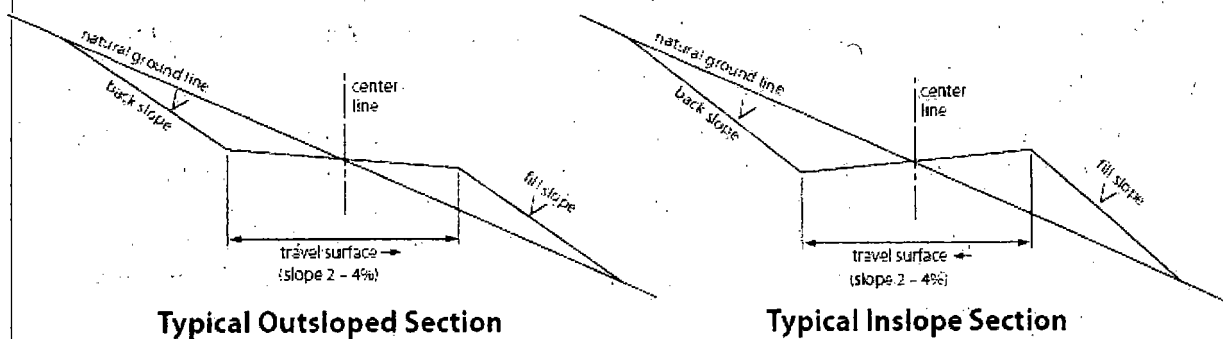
Cross-sections and plans for typical road sections representative of BLM resource or FS local and higher-class roads.
